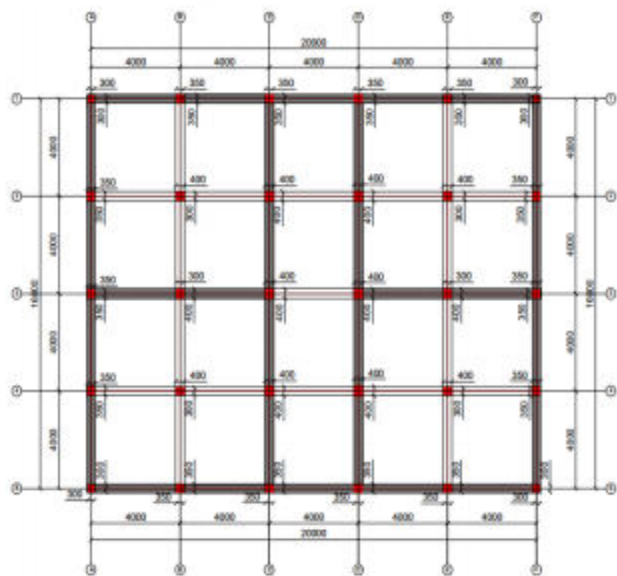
Structural Plan view of 3, 6-Story frame (units in mm)
